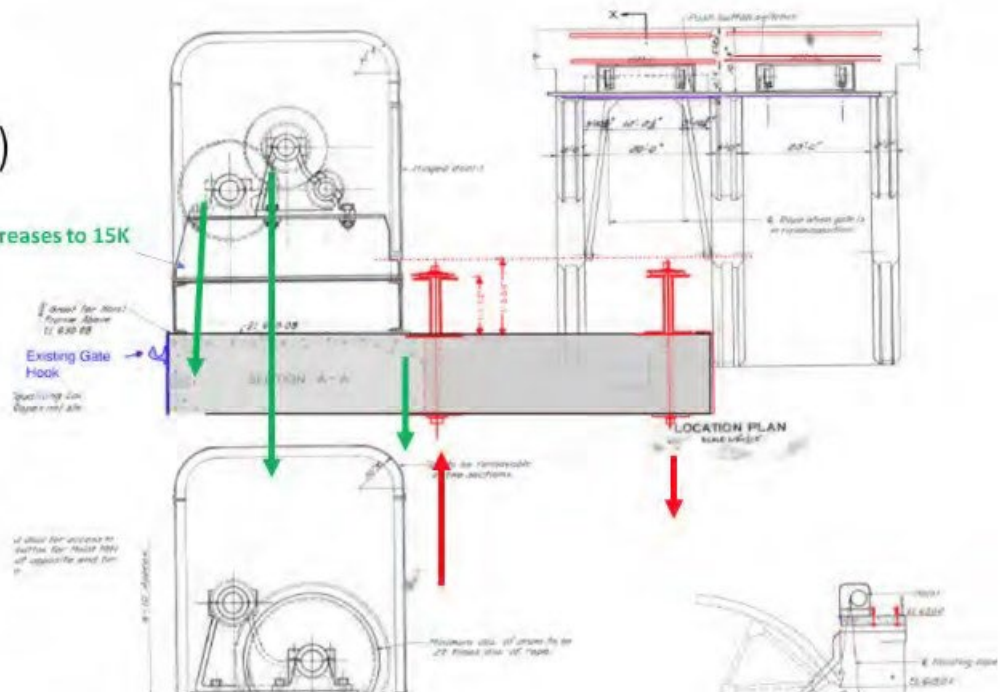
Two Low Profile Beam Reinforcing Option
